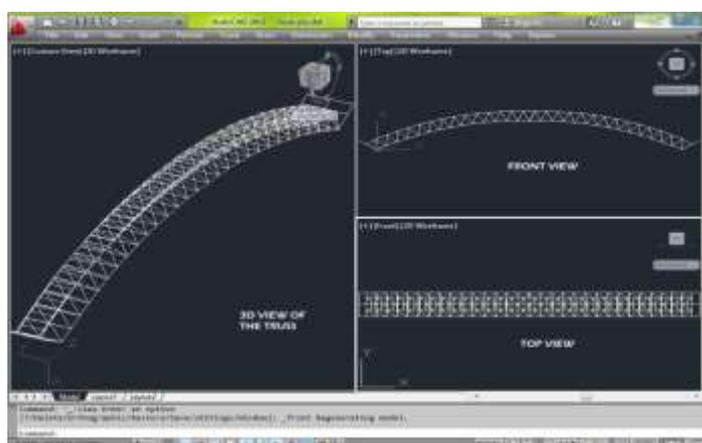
Views of the Single Roof truss which is imported into STAAD Pro
